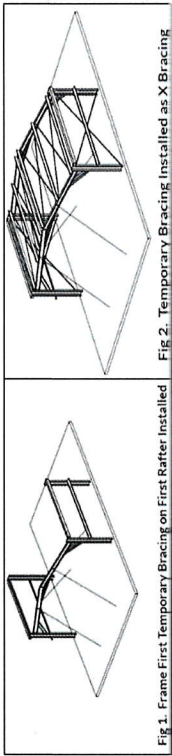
Frame First Temporary Bracing on First Rafter Installed
